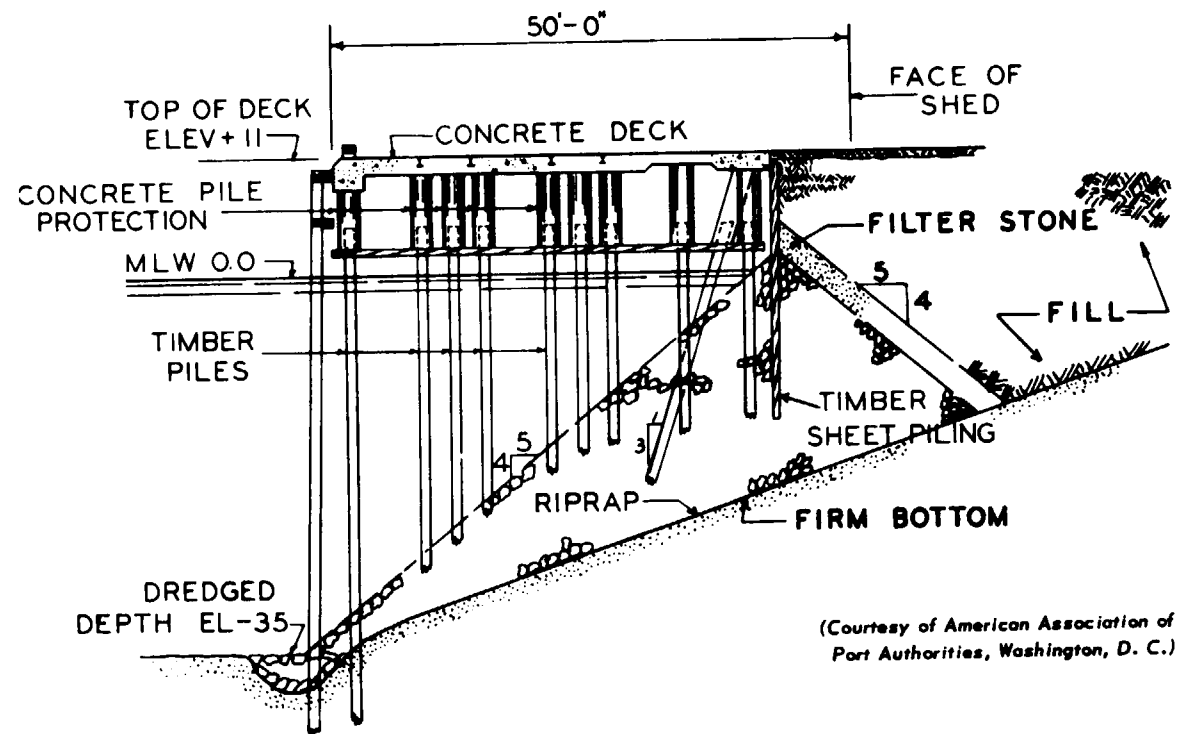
High Level Open-Type Wharf Construction with Concrete Deck on Timber Piles.
